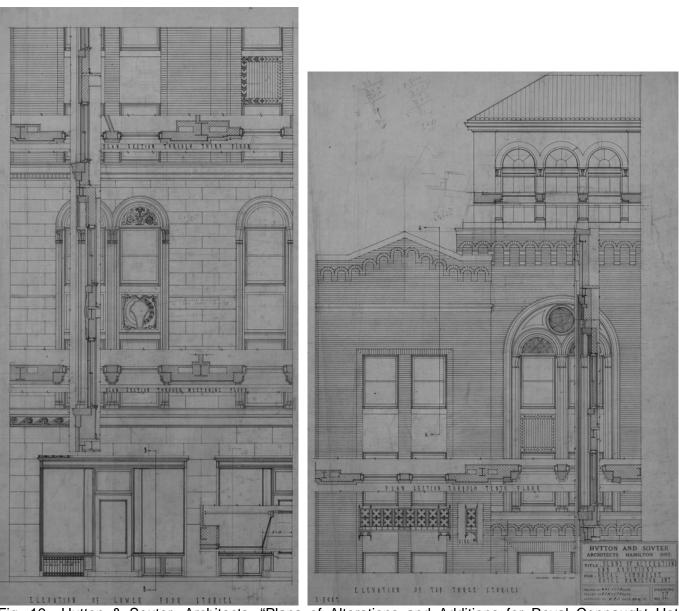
Hutton & Souter, Architects, "Plans of Alterations and Additions for Royal Connaught Hotel Hamilton," 27 Apr. 1931, Souter, Bell, Howard and Souter Fonds, Archives of Ontario, C12-1-0-458, Container # L-717, Barcode B732587, Drawing No. 12 – Elevation of Lower Four Stories & Elevation of Top Three Stories.
